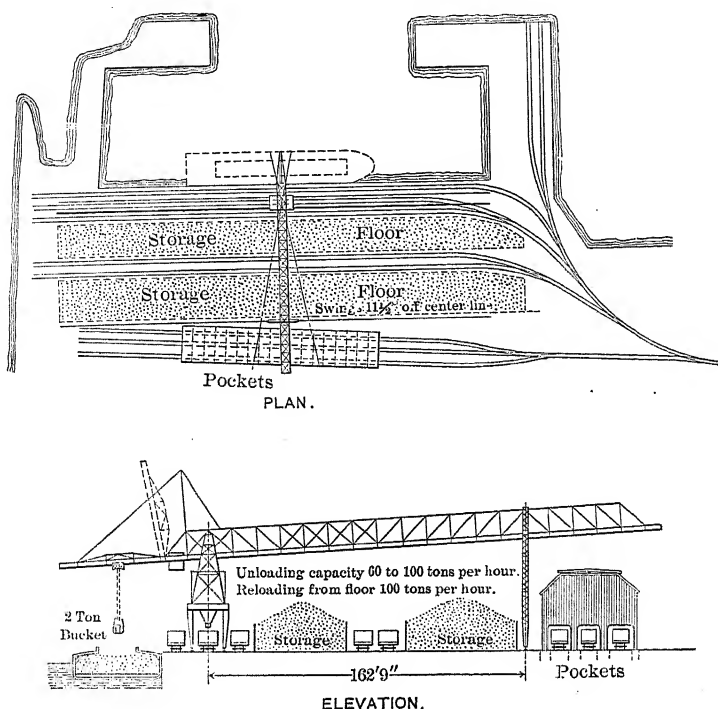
TRAVELING-TRAMWAY STORAGE- AND HANDLING-PLANT, STAPLES COAL CO., FALL RIVER, MASS. PLAN AND ELEVATION.
